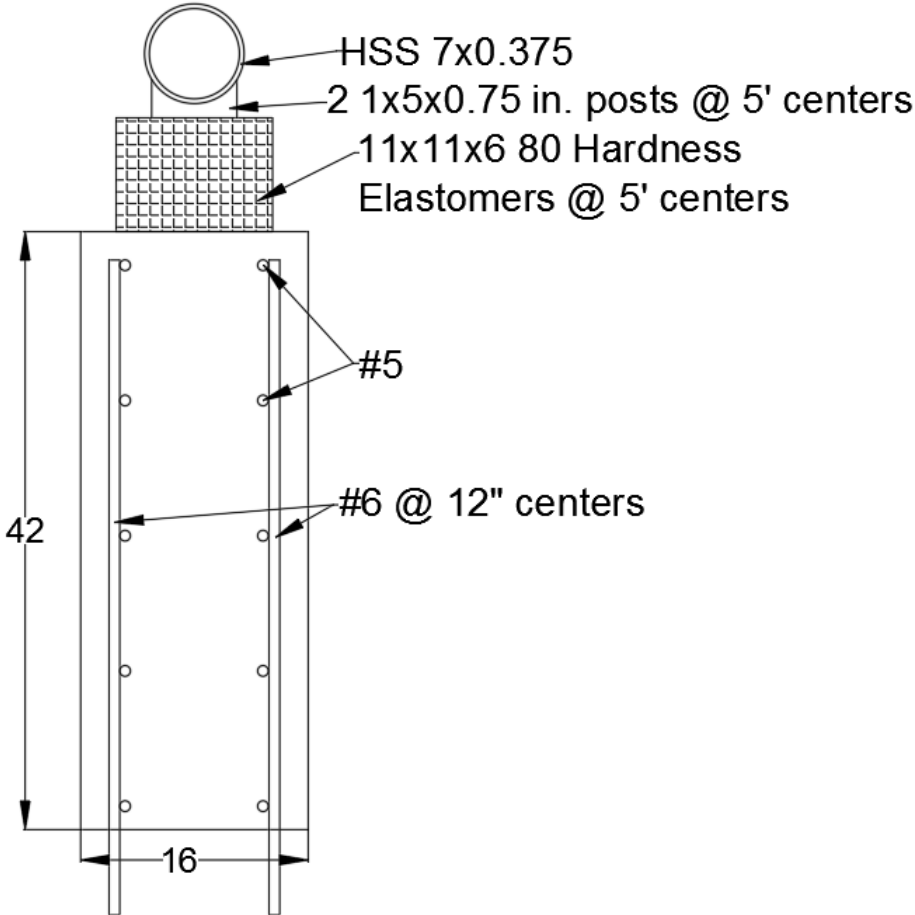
Concept 3 – Rigid Wall and Absorbing Steel Rail Example
